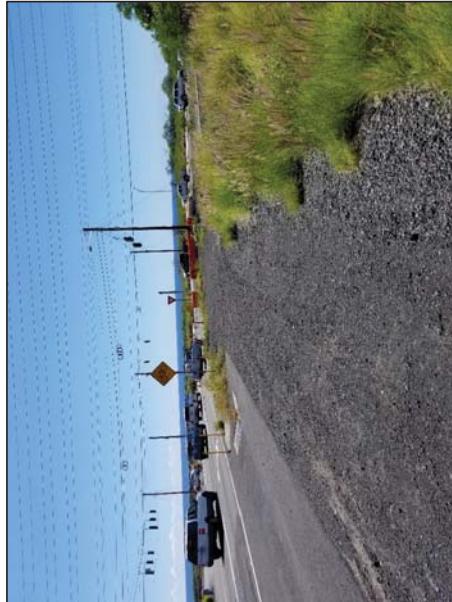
Photo showing the Queen Ka‘ahumanu Highway and Hina Lani Street intersection within the Northern Section of the project area; view to west
